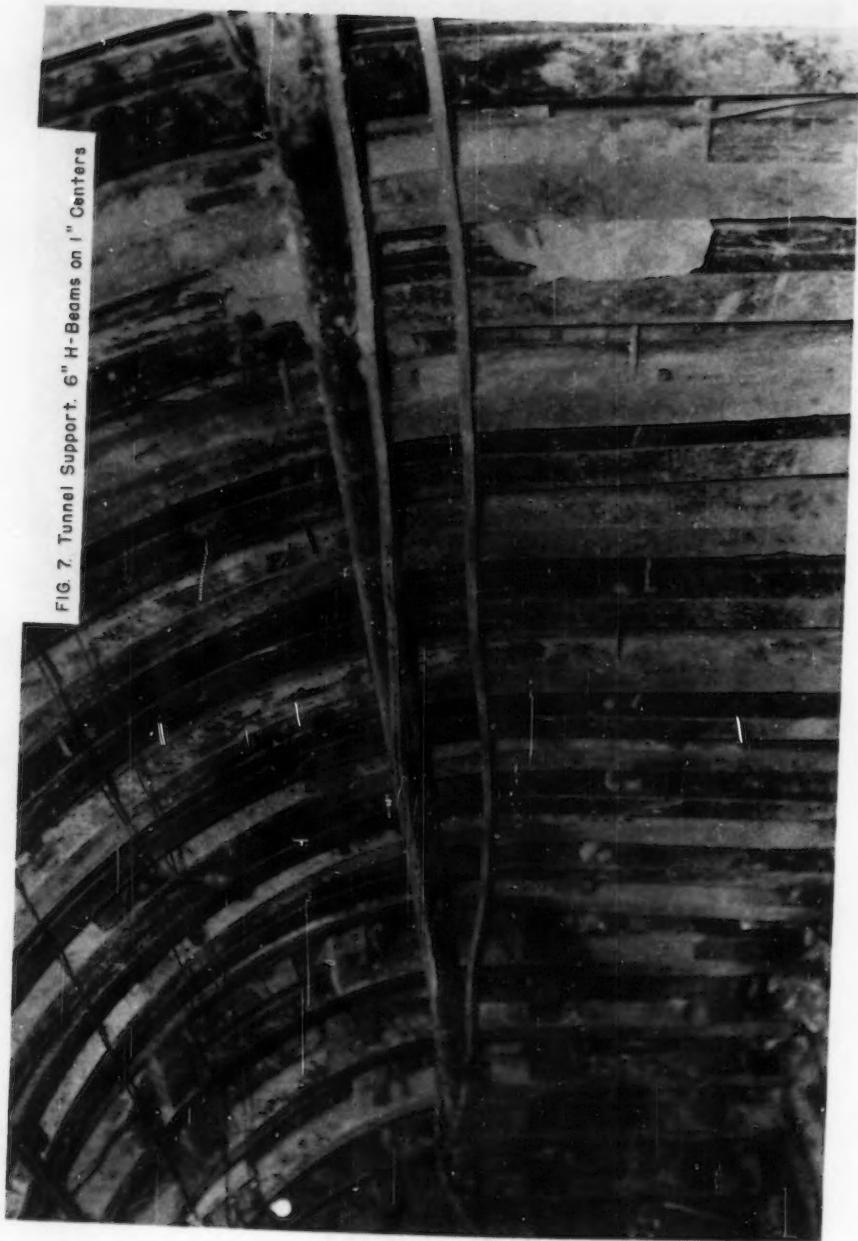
Tunnel Support. 6" H-Beams on 1" Centers
